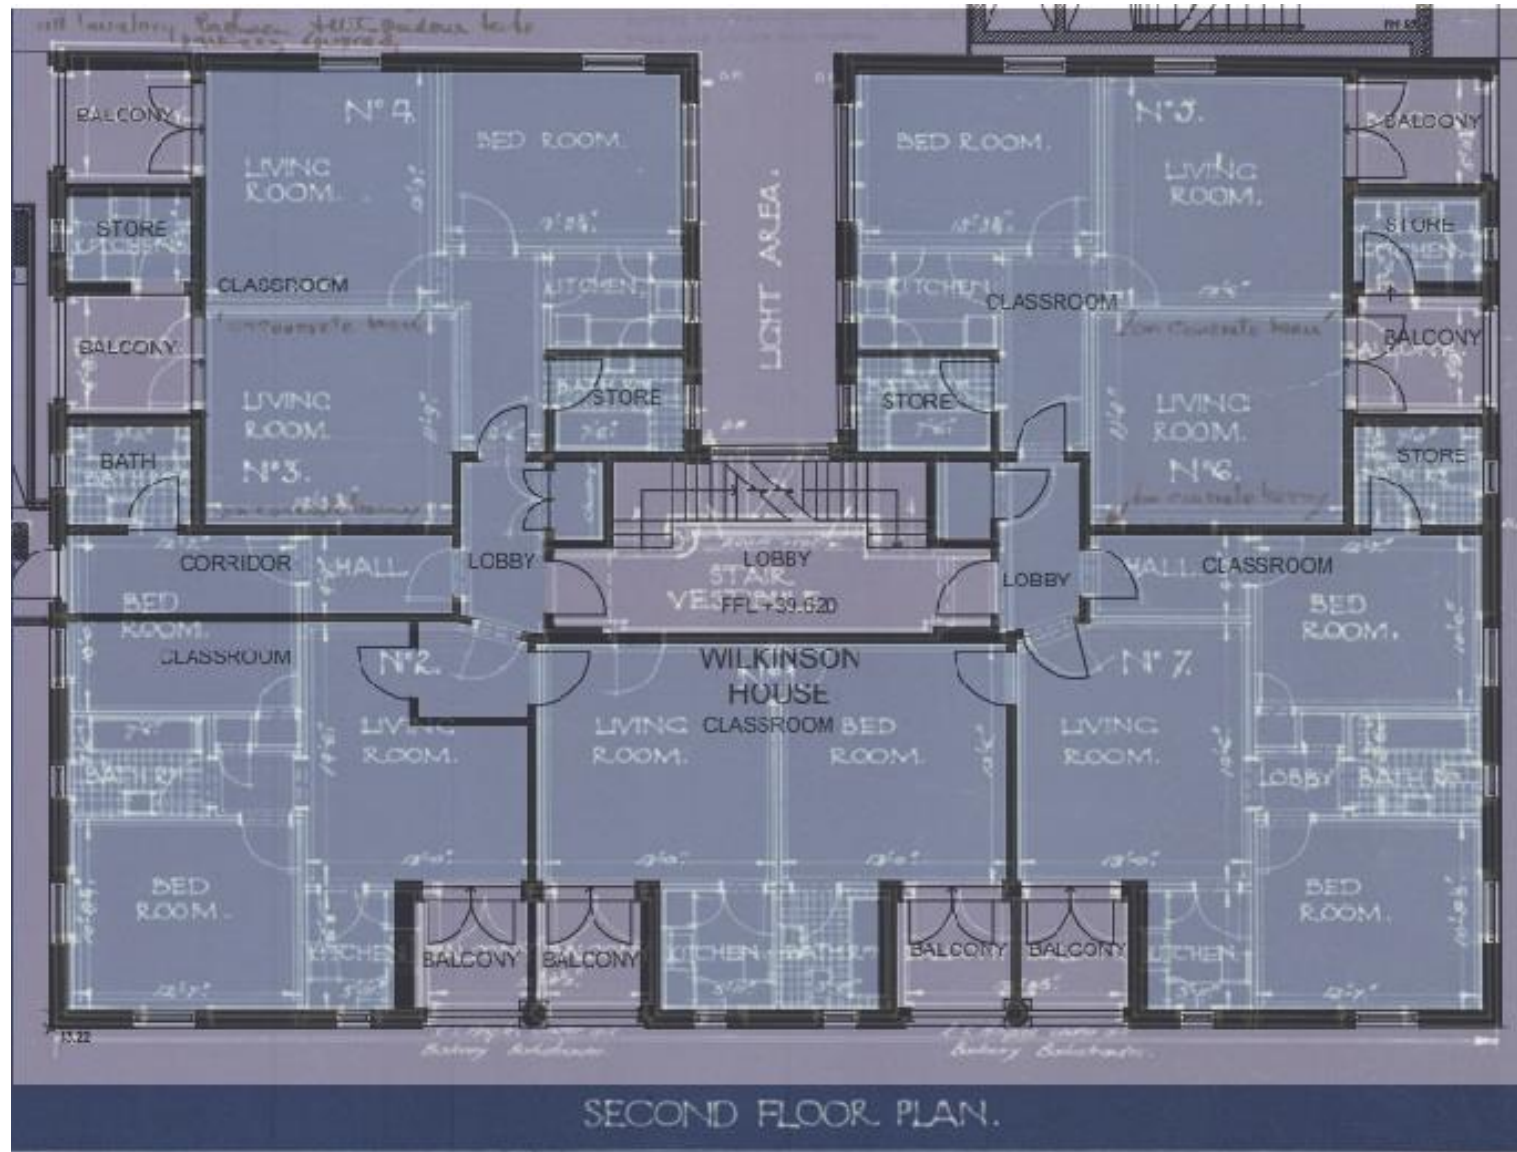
Overlay of original plans of the Gwydir Flats (base layer) over current Level 2 floorplan of Wilkinson House (top layer).
